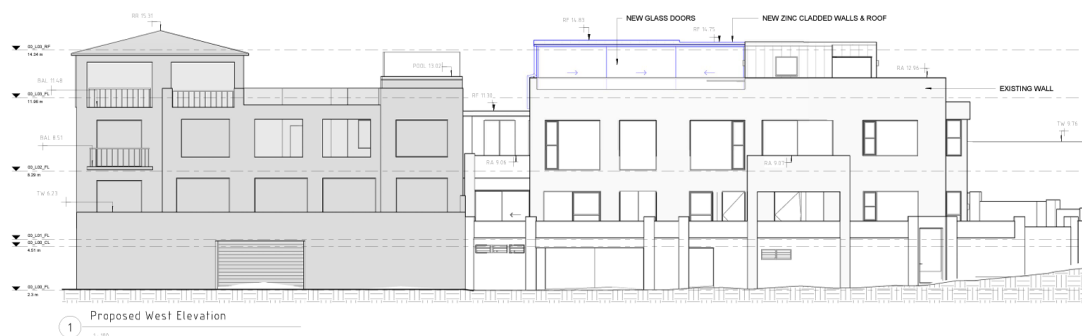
West Elevation (Source: Dreamscapes Architects, 2022)
